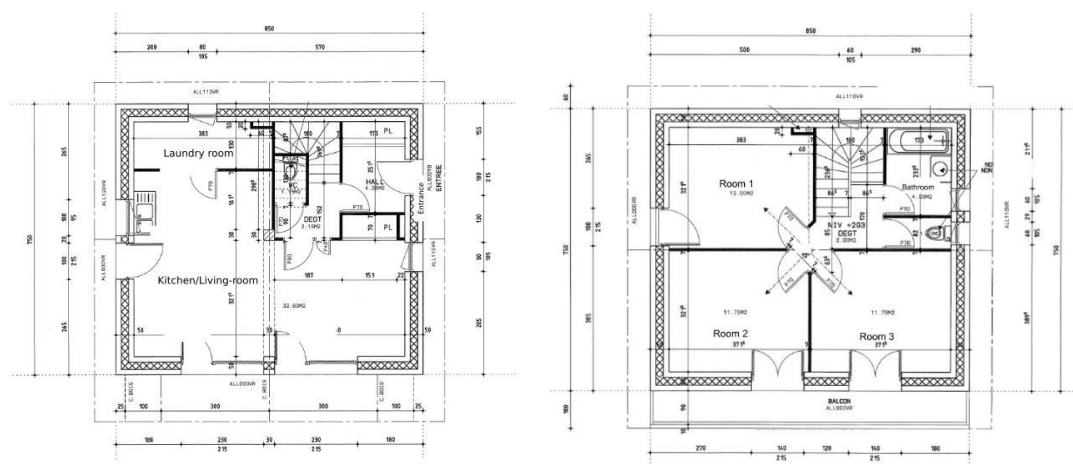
Plans of the INCAS house, ground floor (left) and first floor (right)
